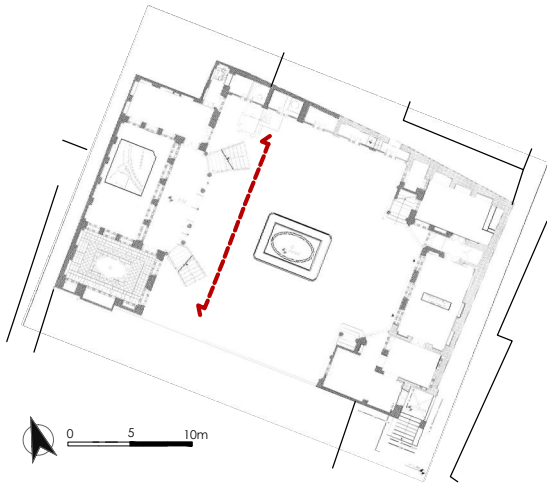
Deformation of the balcony in the northwest building mass.
